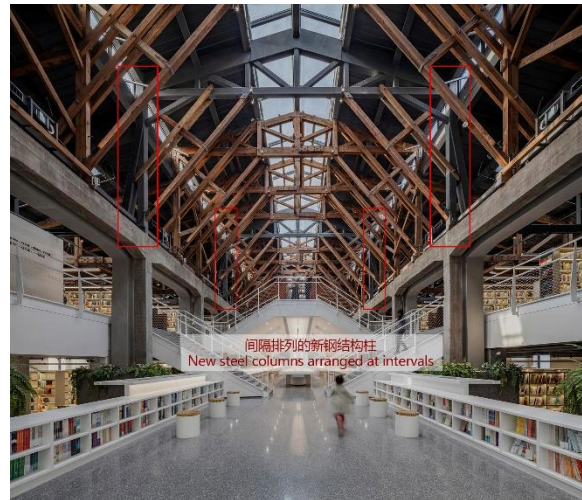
53 Shenyang Dongmao Warehouse Structural Replacement
